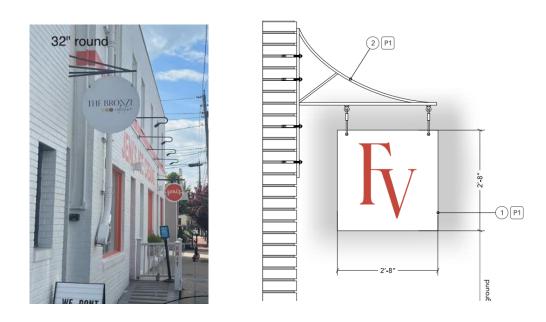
Existing South Patrick Street façade with proposed blade sign location and design
